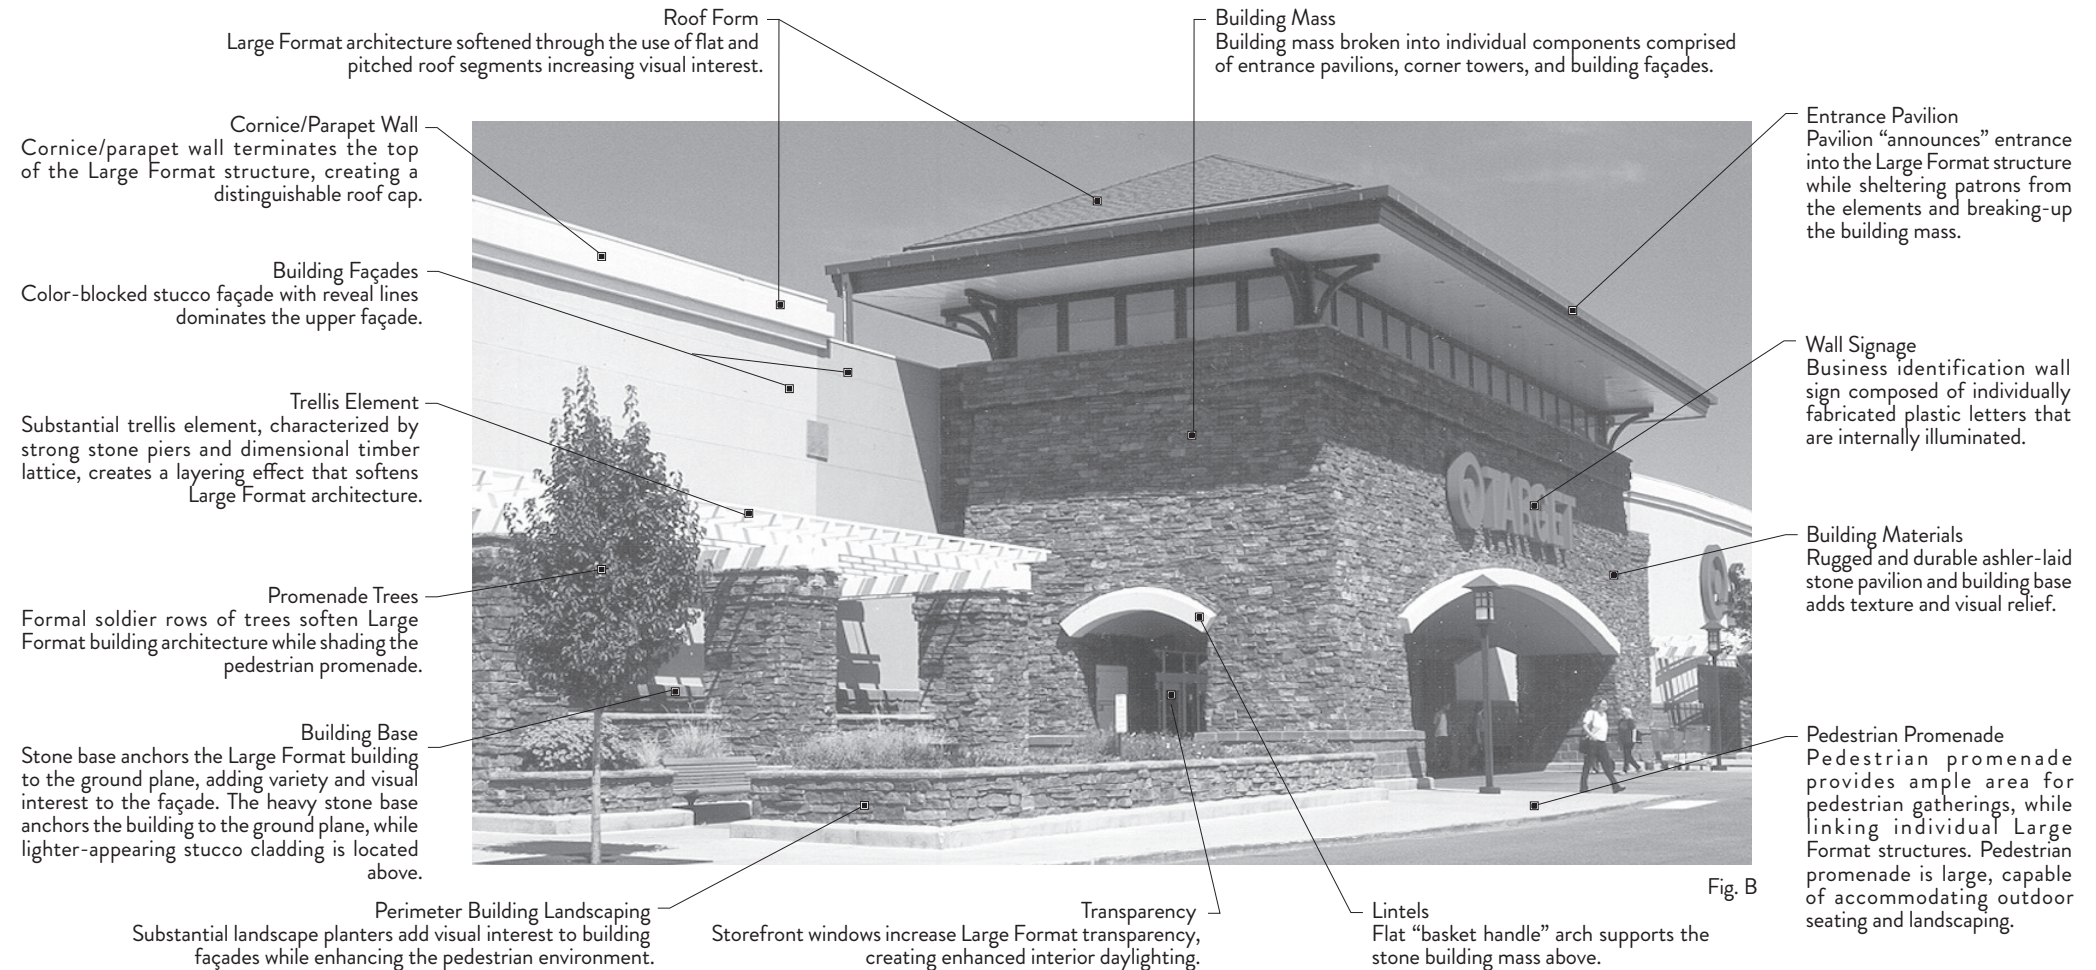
Use building materials to add texture and visual interest. Notice how the rugged stone base visually anchors the Large Format building to the ground plane, with lighter stucco walls occurring above.
